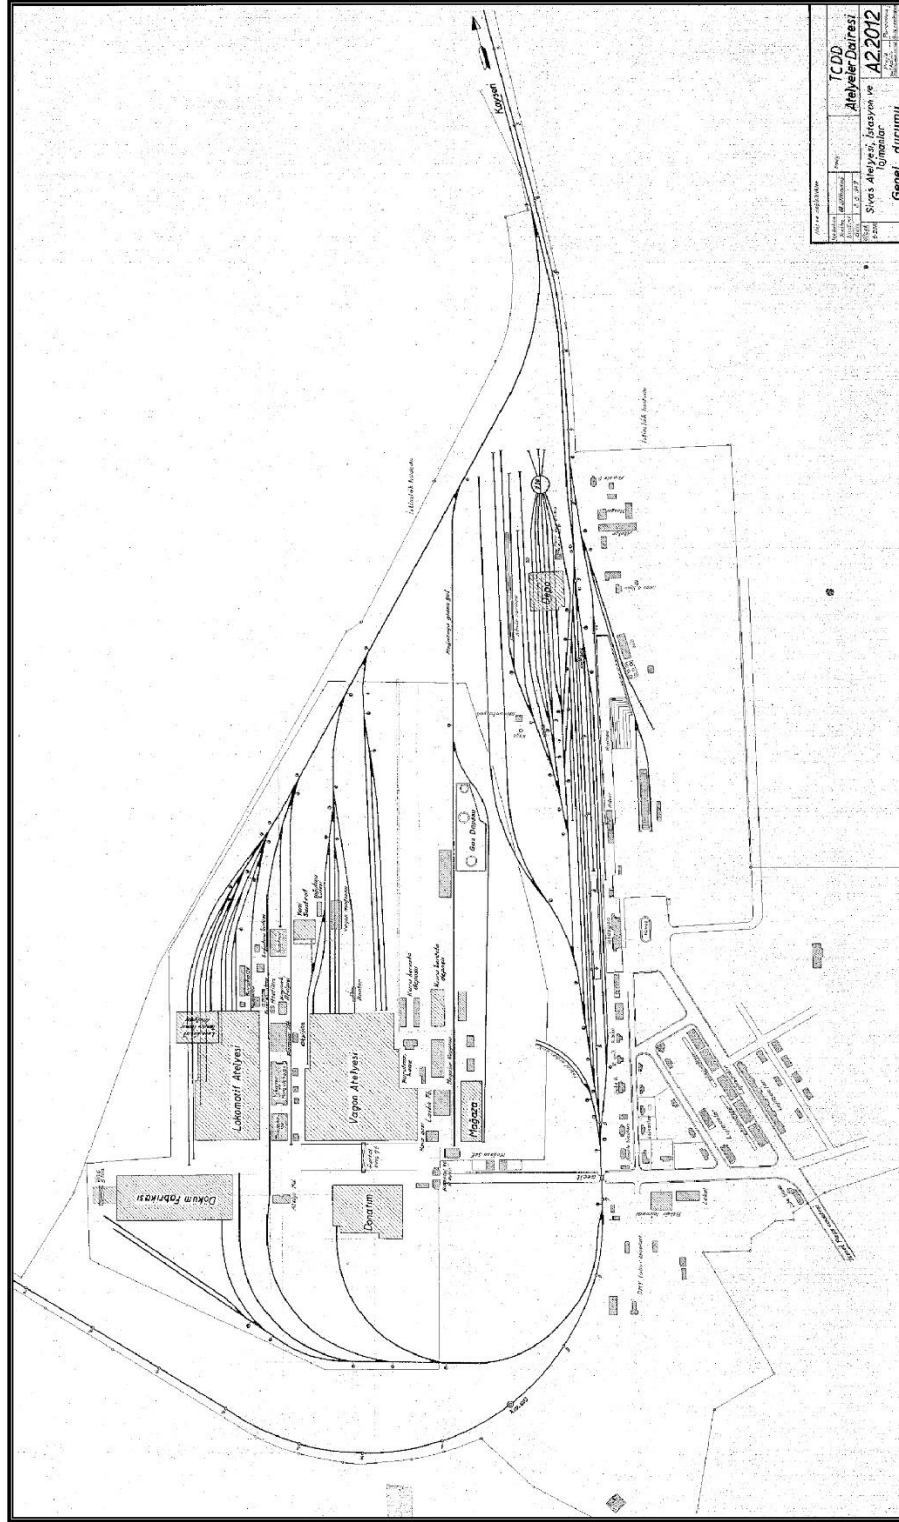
Site plan of Sivas Railway Repair Shop Campus in 1947
